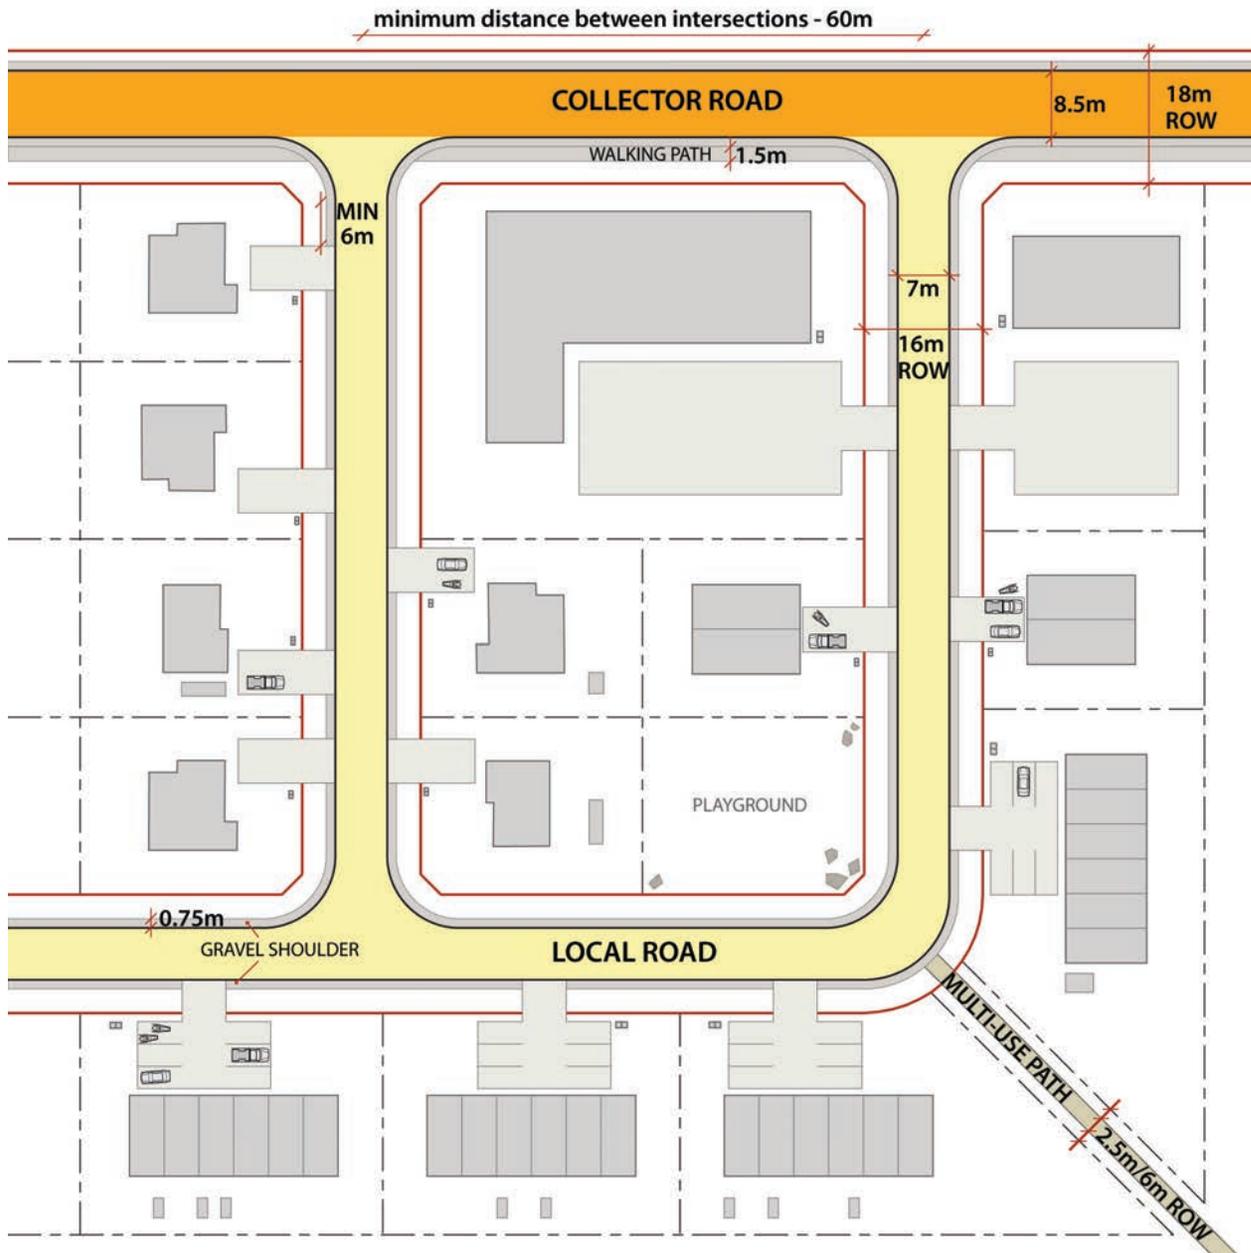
Minimum widths for the rights of way and the traveled road surfaces are illustrated for collector (orange) and local (yellow) roads within a subdivision on trucked services.
